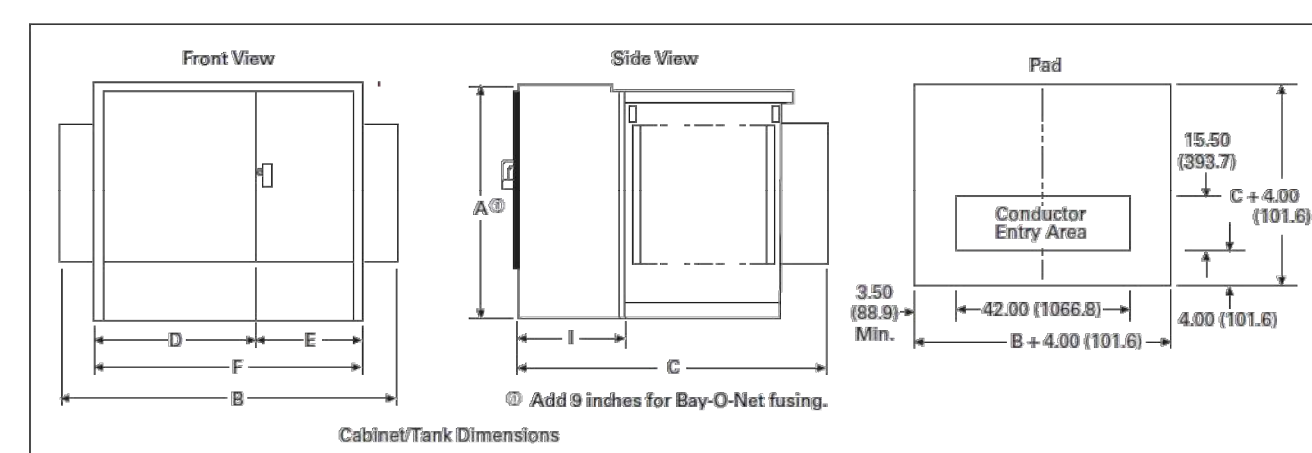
Pad-Mounted Transformer—Dimensions in Inches (mm)
